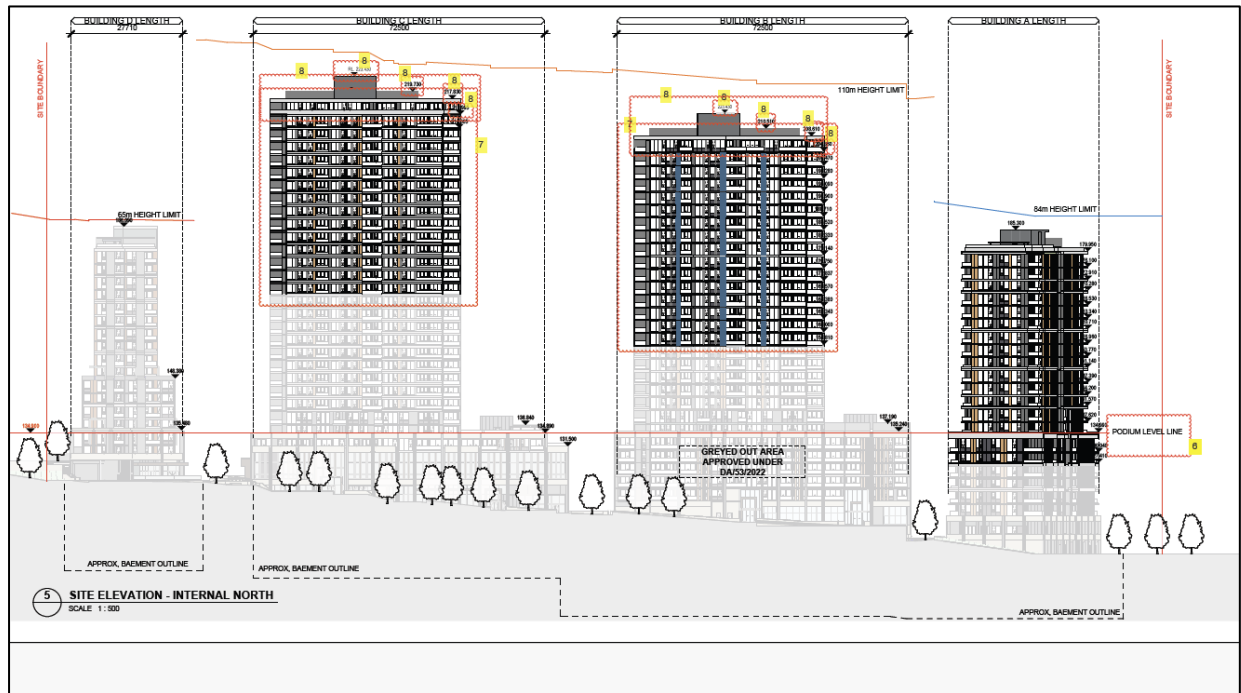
Site Elevation East-West (from left to right Building D (no change), Building C, B and A) (Source: Crone Architects, Site Elevation, CP-DA-A-1-0-2501, 30 April 2025)
